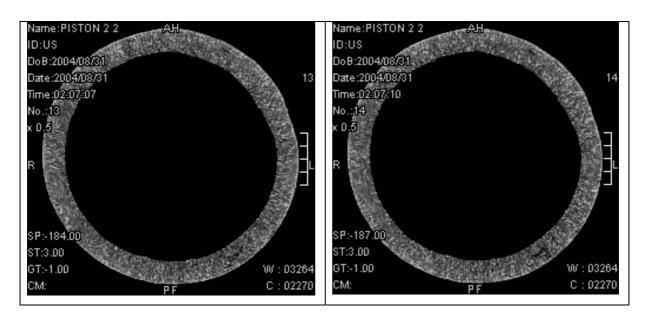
CT scan images of piston extruded steel fibre reinforced ECC pipe
